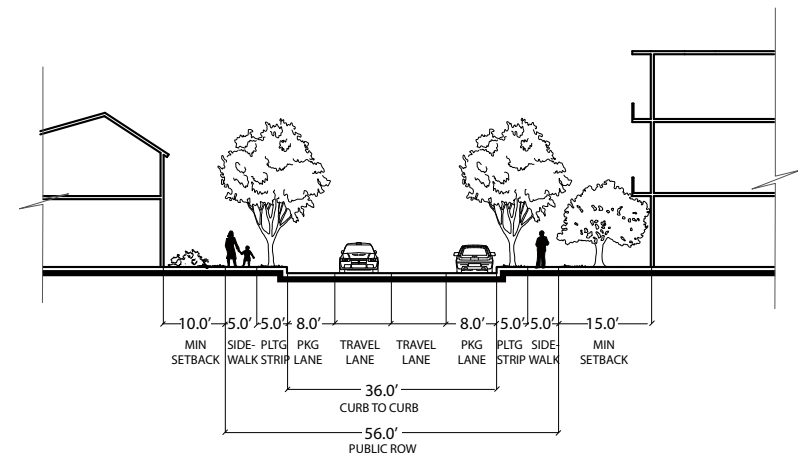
Typical Local Street with Buildings 2 to 3 Stories
